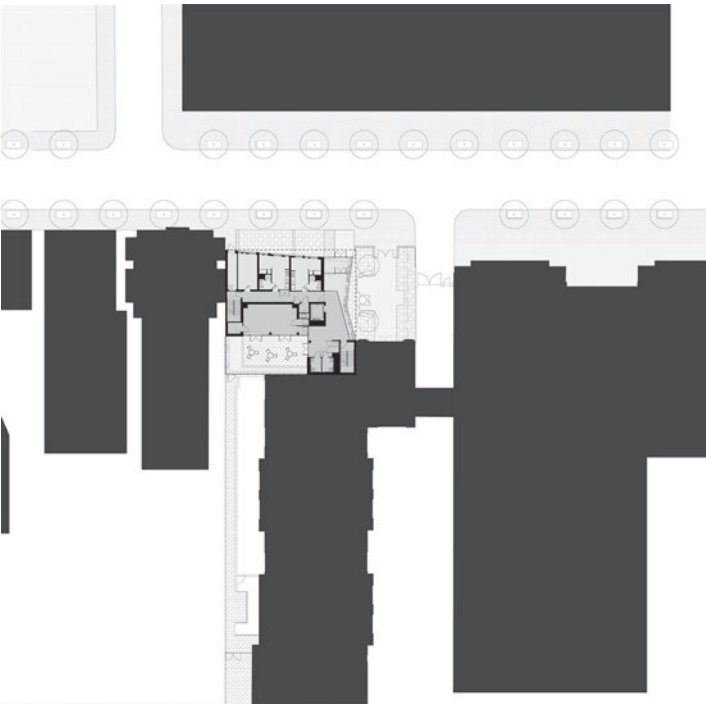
La Casa Housing site plan © Studio Twenty Seven.
